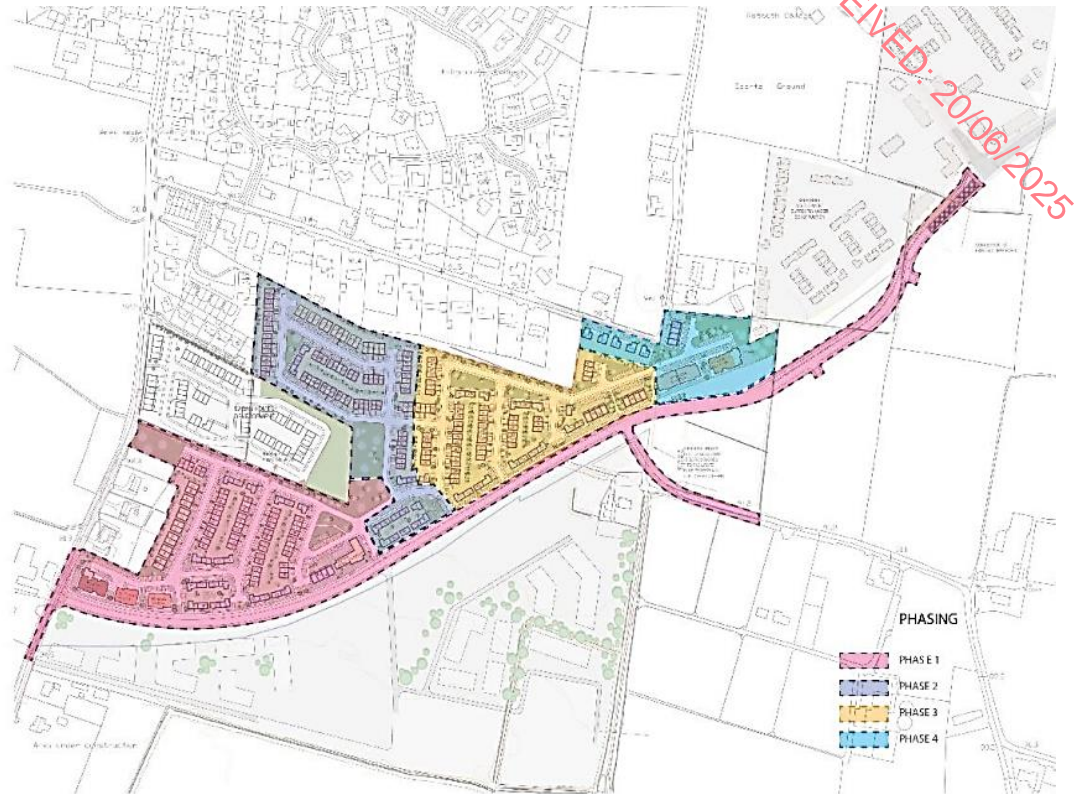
Phasing Plan for the delivery of the Proposed Development on subject site (Source: Fewer Harrington & Partners Architects)).
